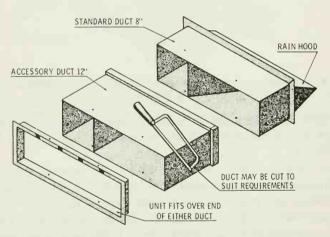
Typical air ducts that are employed in the installation of consoletype air conditioners.
